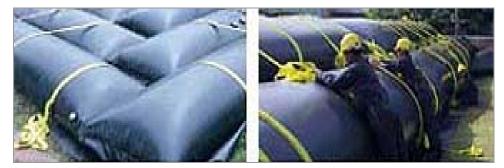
Water-filled temporary barriers deployed and anchored in place. Installation designed for a 3-tiered placement, protecting to approximately 7 feet in depth.
